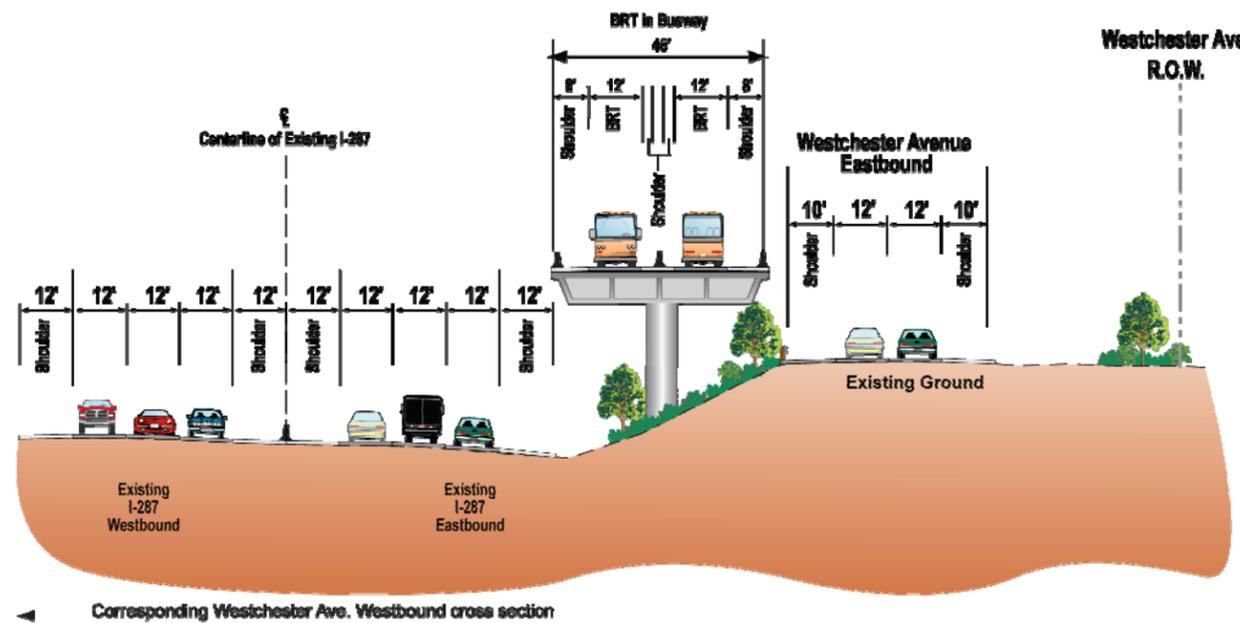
BRT Busway East of White Plains Cross-Section at Butcher Avenue
